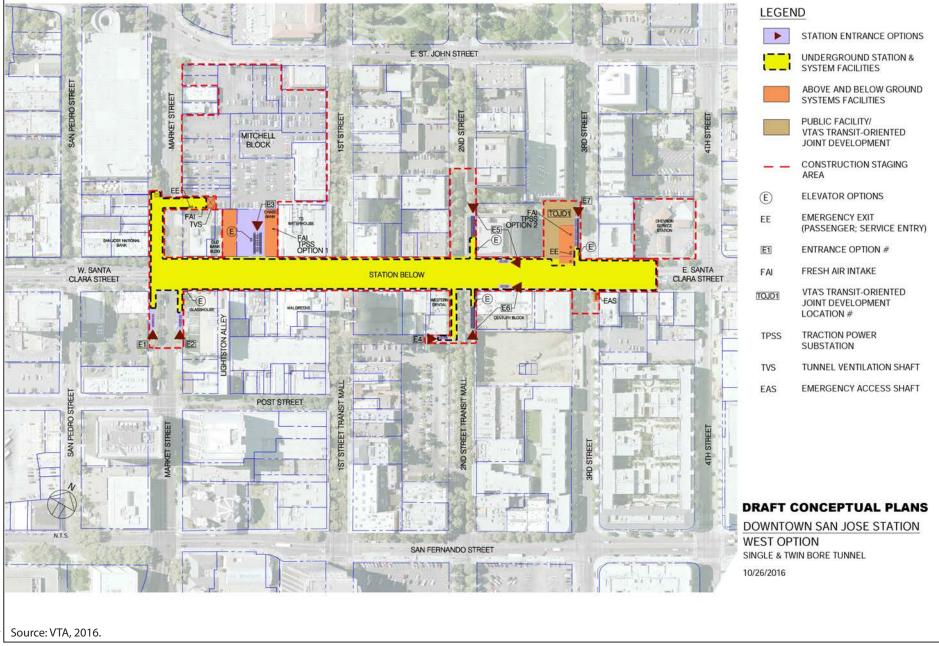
Downtown San Jose Station West Option Plan (Twin-Bore and Single-Bore) VTA's BART Silicon Valley–Phase II Extension Project
